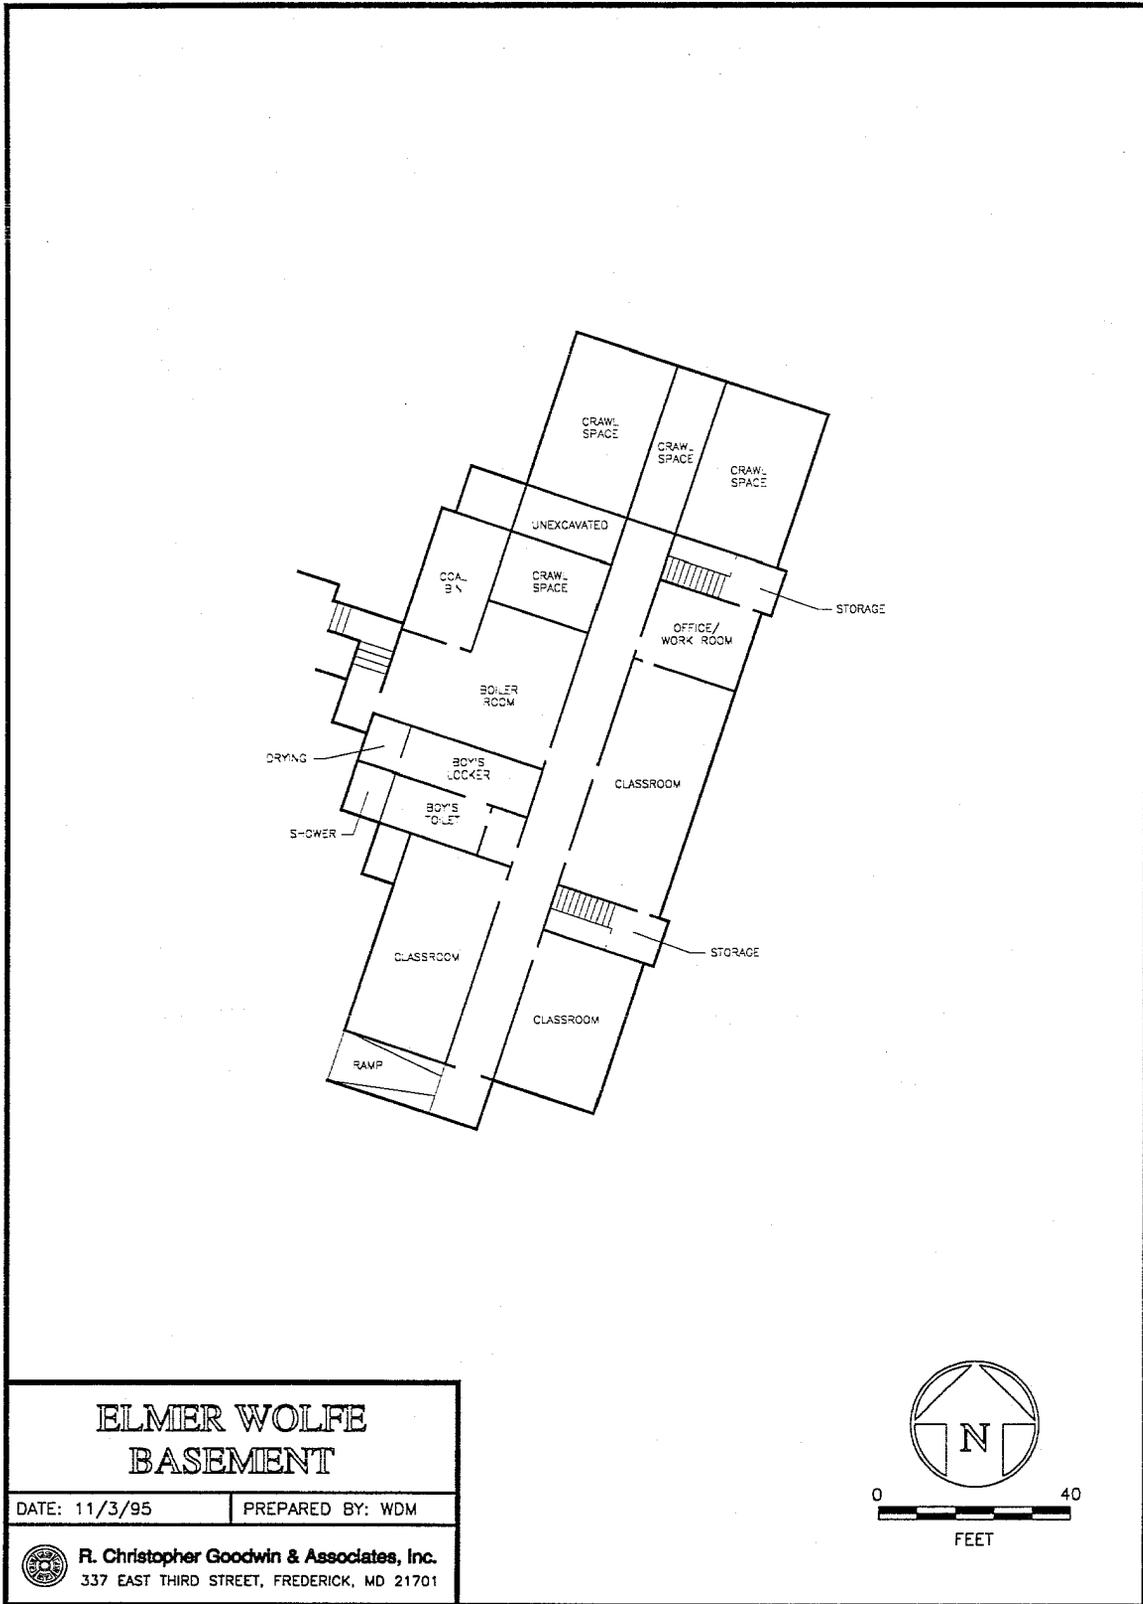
Basement floor plan, Elmer Wolfe School, with current room designations
